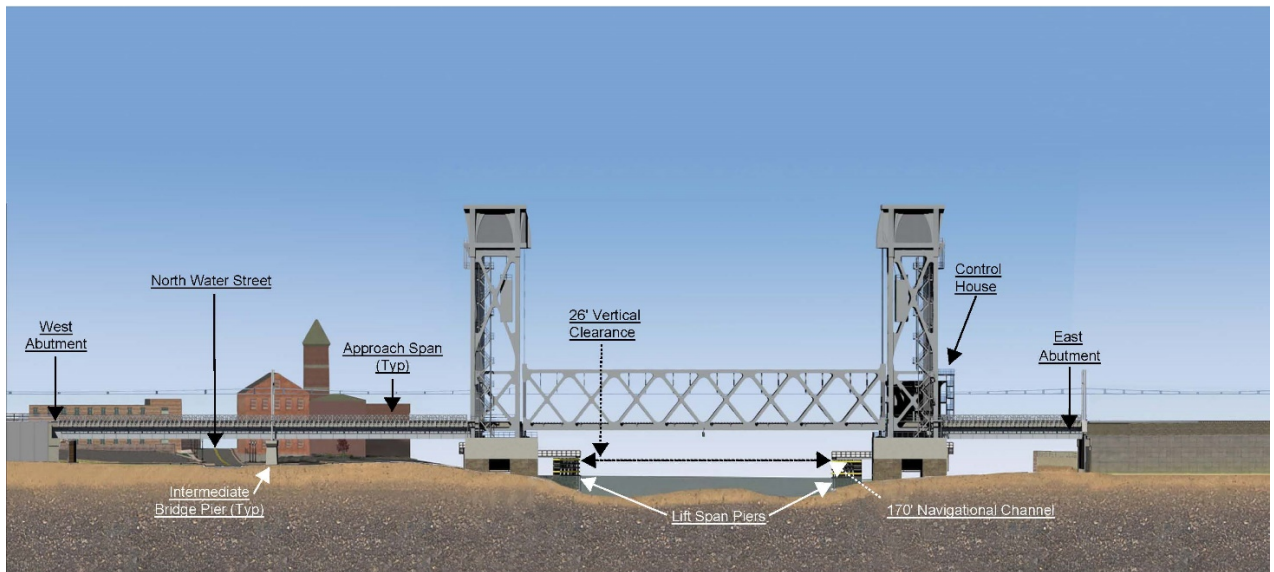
Elevation View of the Long Span Vertical Lift Bridge, Refined Design
